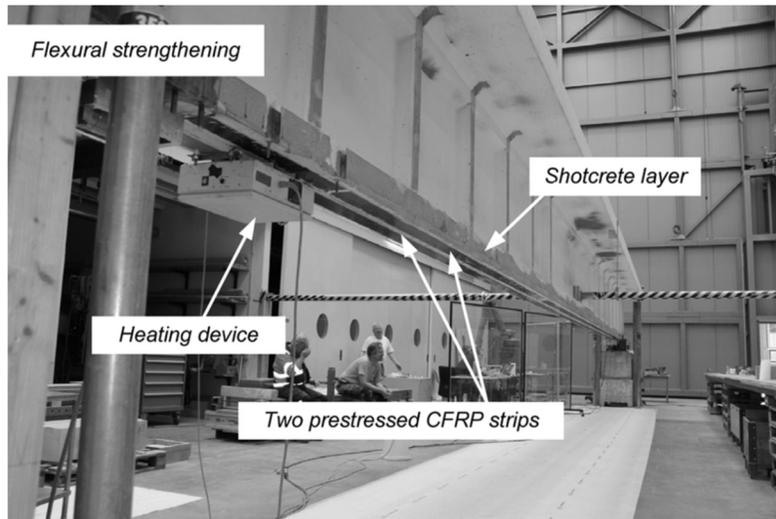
Flexural strengthening using two prestressed CFRP strips on the girder soffit [87]
